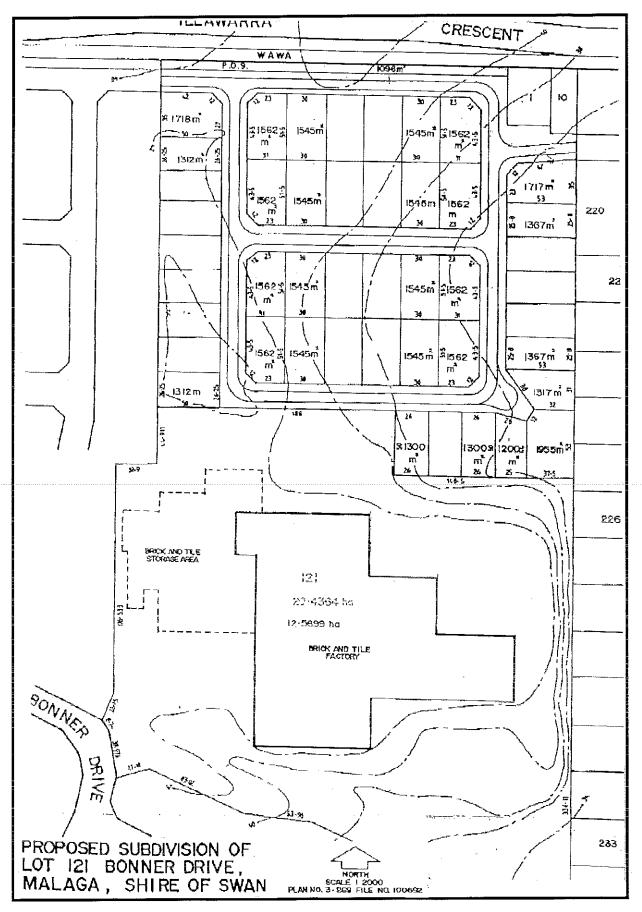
(b) Outline Development Plan for proposed subdivision at Malaga
